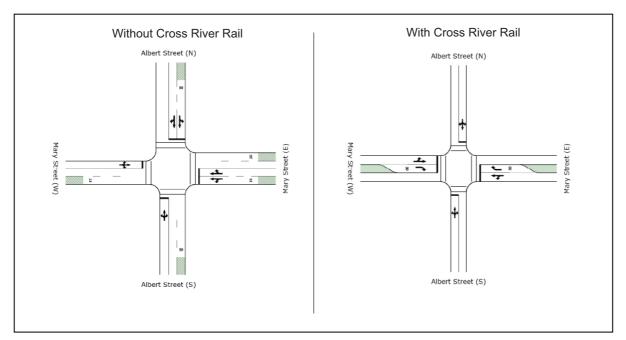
Proposed changes to intersection geometry at Albert Street/Mary Street intersection
